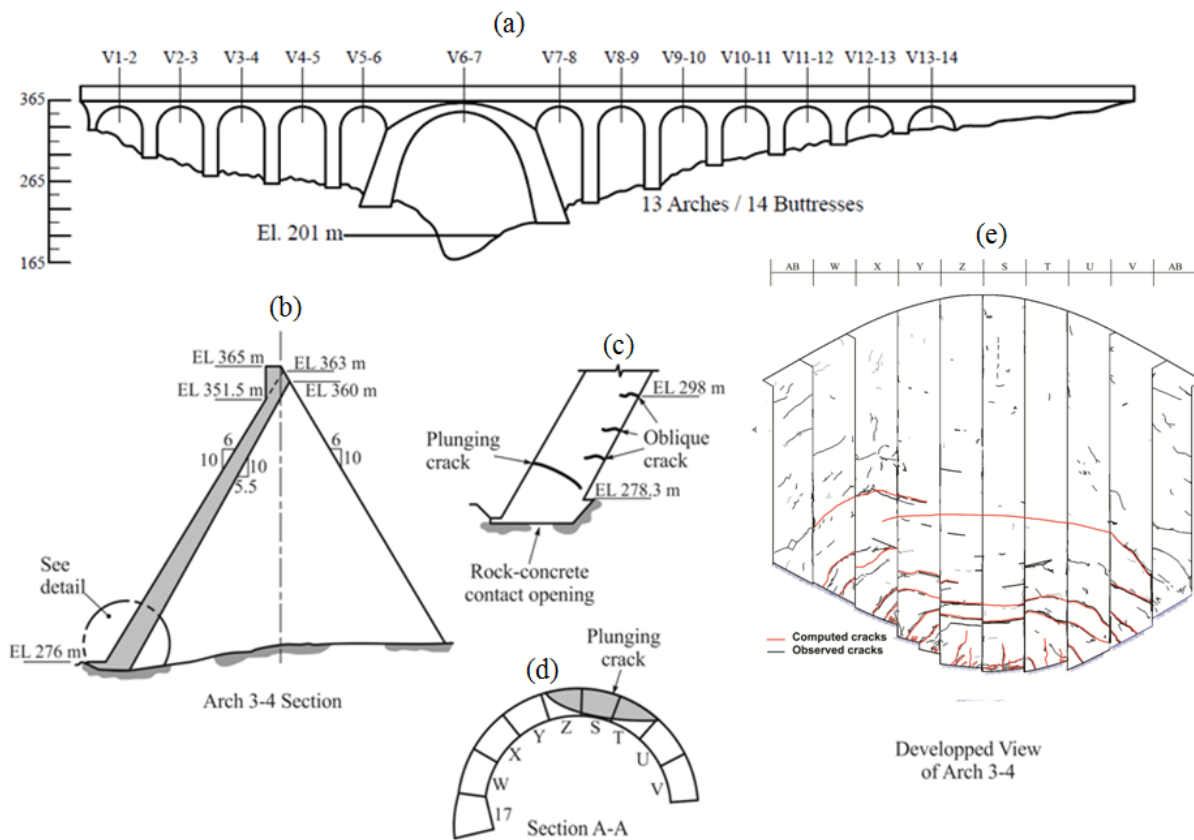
Daniel Johnson dam: (a) dam's view and characteristics; (b) arch 3-4 section; (c),(d) crack pattern; (e) computed vs observed downstream face cracks
